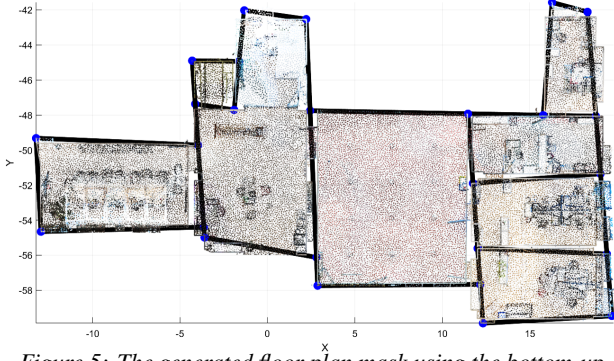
The generated floor plan mask using the bottom-up plane-plane intersection method.
